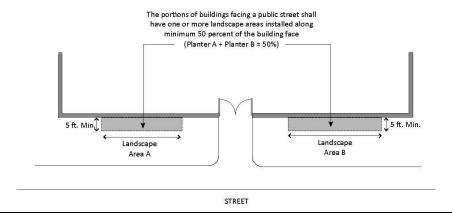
N1.D: BUILDING PERIMETER LANDSCAPING
